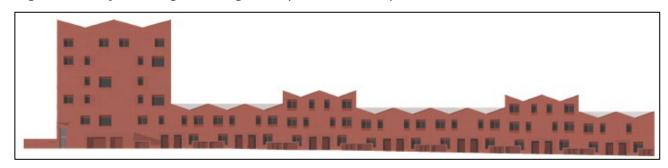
Façade Design Building Plot H3 (East Elevation)
